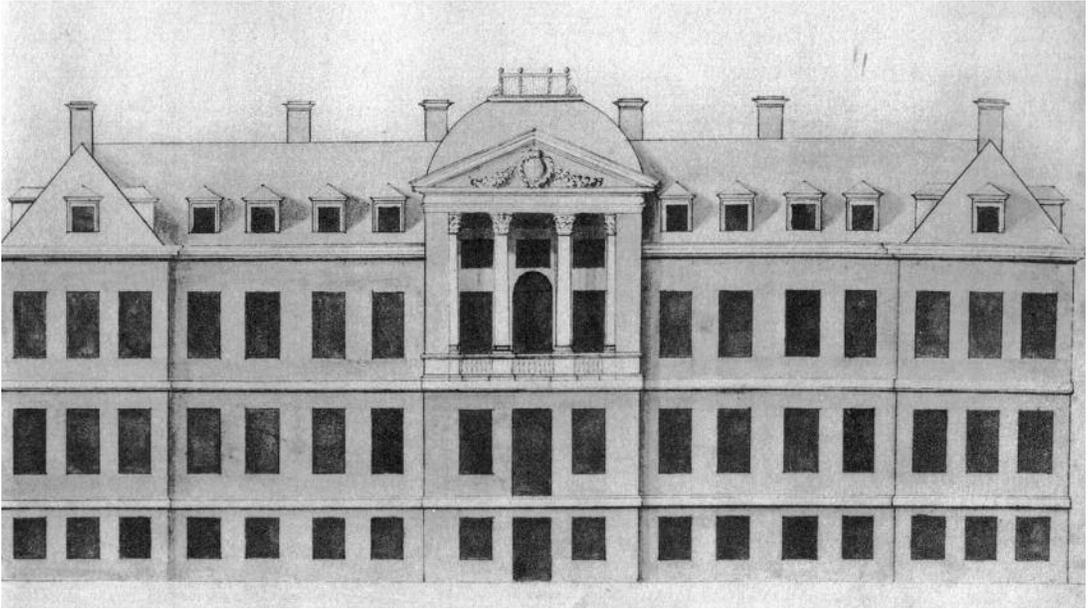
Robert Hooke, unexecuted design for the garden elevation of Montagu House, London.
